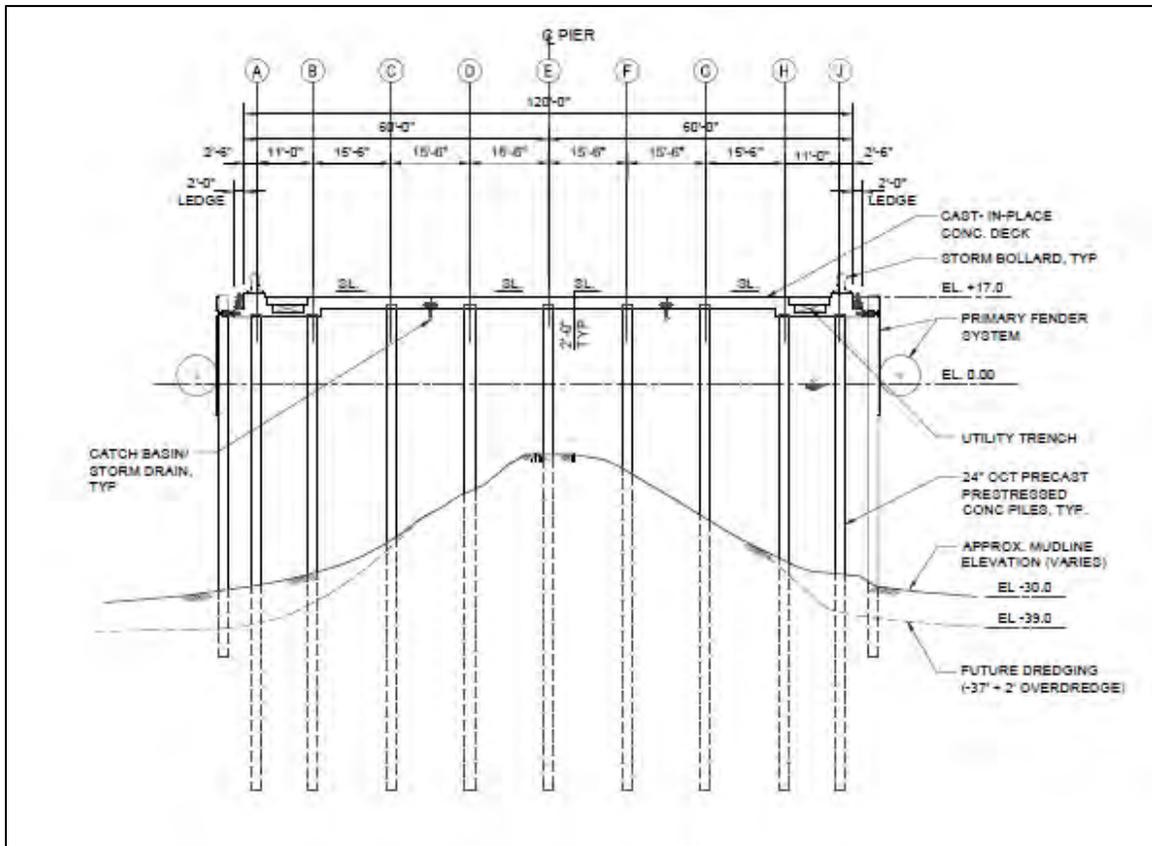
Cross-Section of Proposed Pier 6 (typical)
